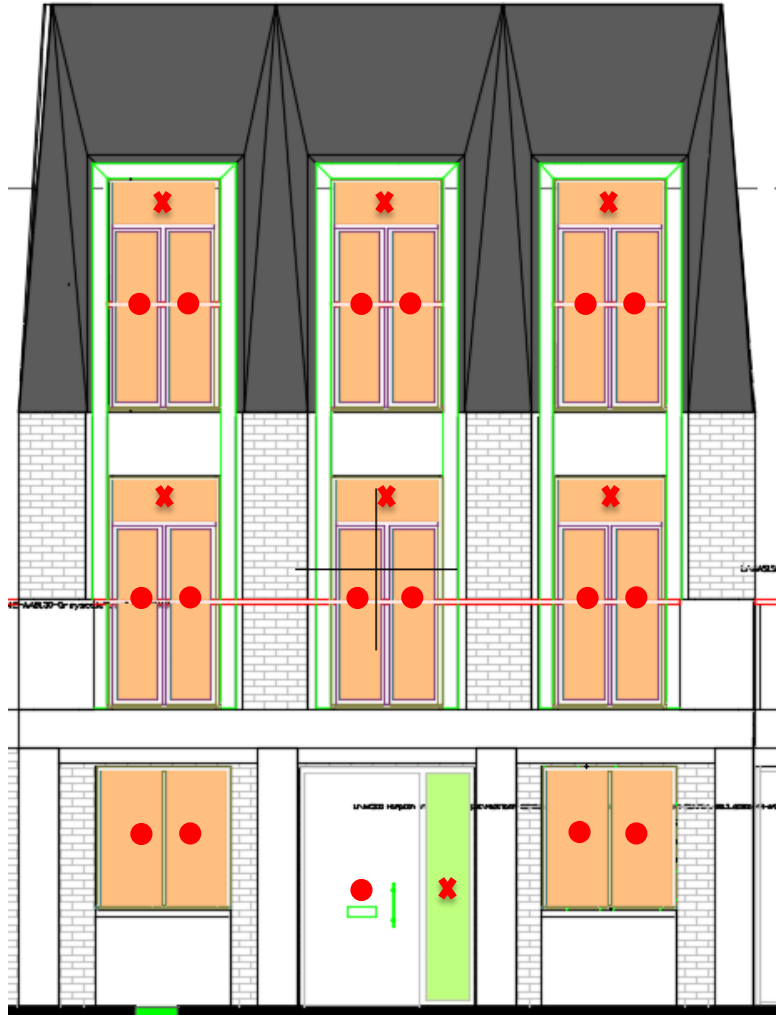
House Type 2 South Facing Elevation: Location of Openings
